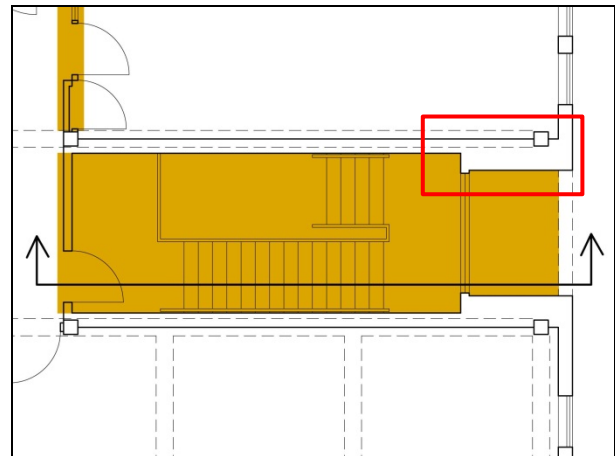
Typical Upper Level plan at stairway. Red box indicates area of enlarged plan shown in Figure G-12, below.
